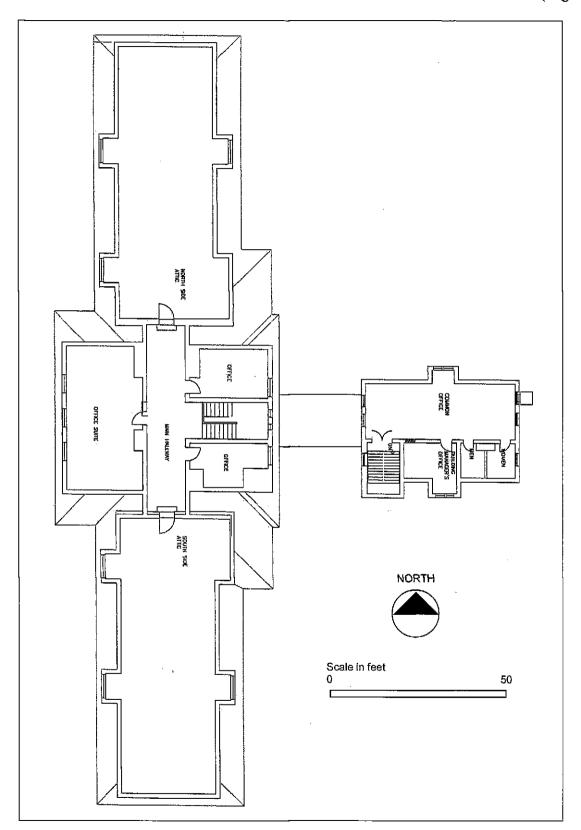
Third/attic floor plan, 2008. Source: HNTB Corporation.
